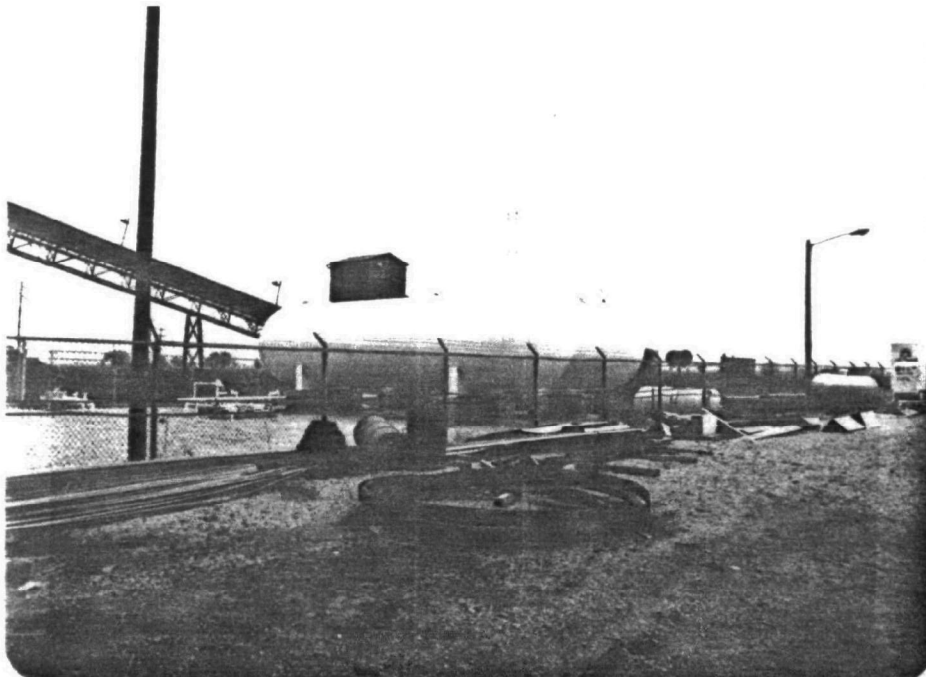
View from ground level facing southeast showing the propane tank farm.
